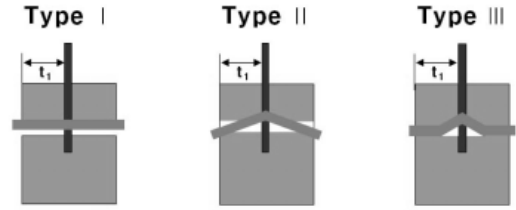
Yield failure type of fastener connection with inserted 1 steel plate (a) Type I (b) Type II (c) Type III.
